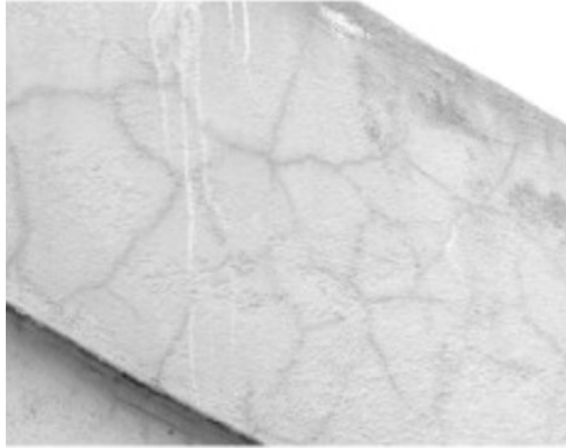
3: ASR cracking on a bridge built in Czech Republic (Lukschová et al., 2008).
